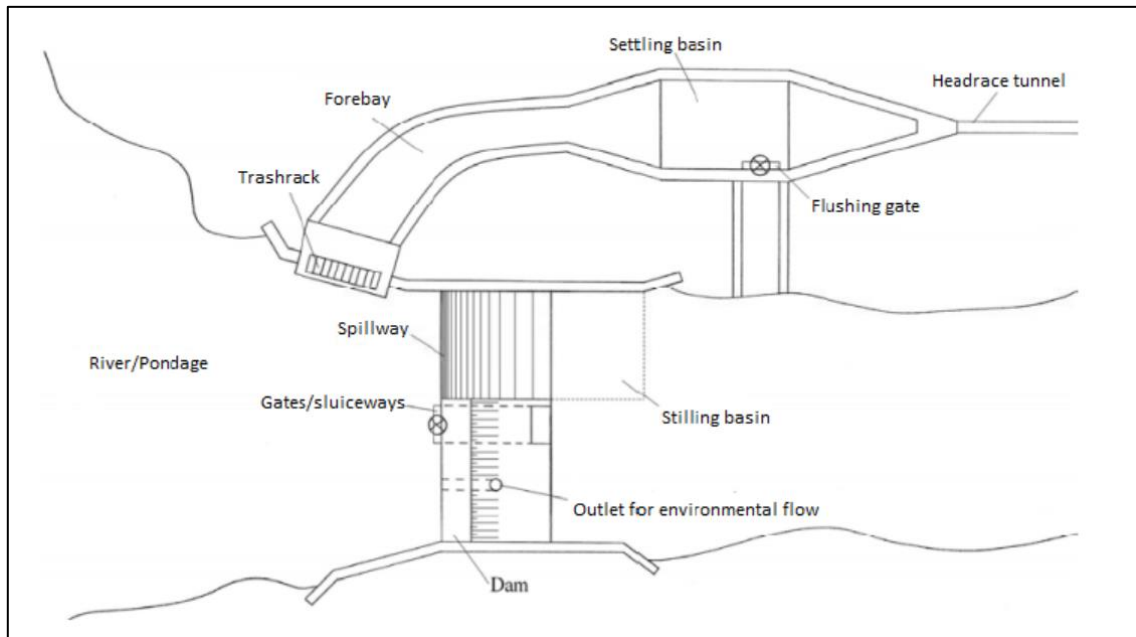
Typical headworks arrangement of a run-of-river hydropower plant. (Jennsen, Tesaker, Steinar, & Huber, 2006)
